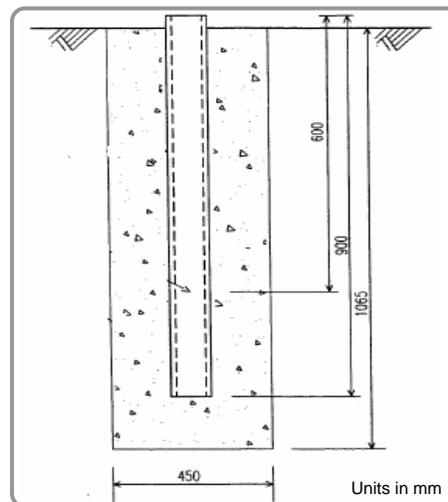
Concrete footing suggested by AASHTO (distance in mm)
